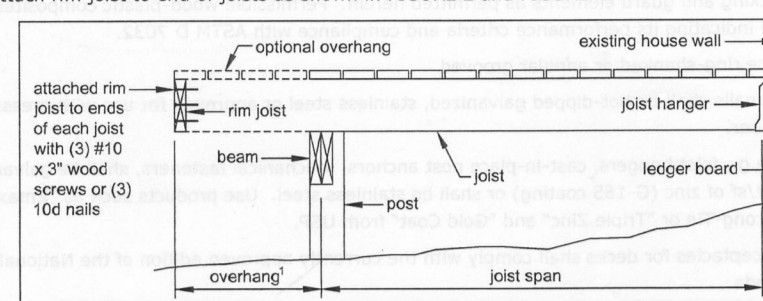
JOIST SPAN WITH OVERHANG - DECK ATTACHED AT HOUSE
